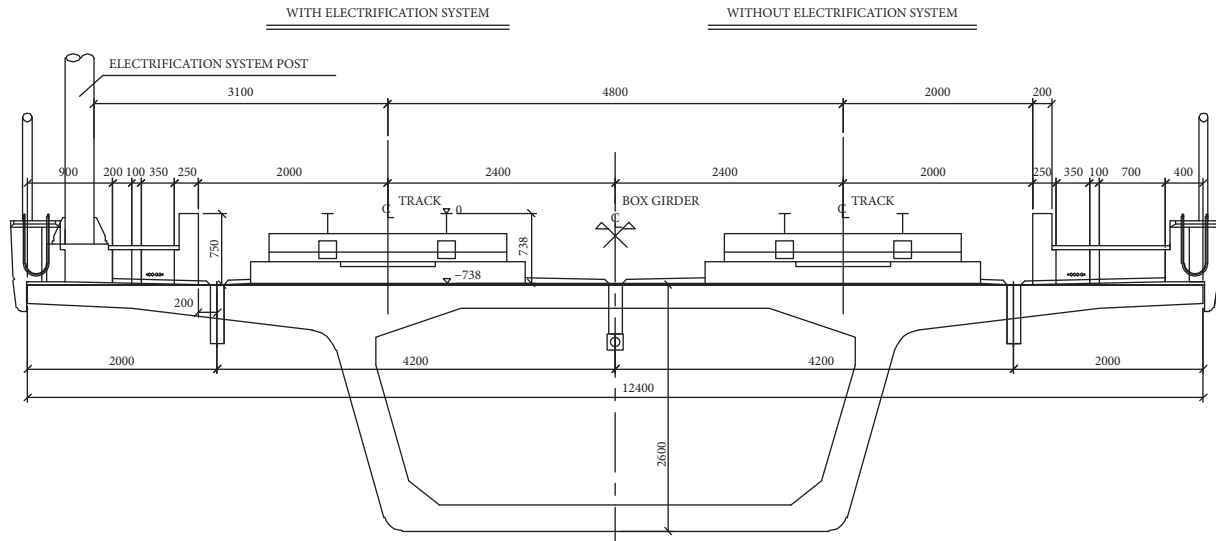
Cross-section of the box beam at the middle span (unit: mm).
